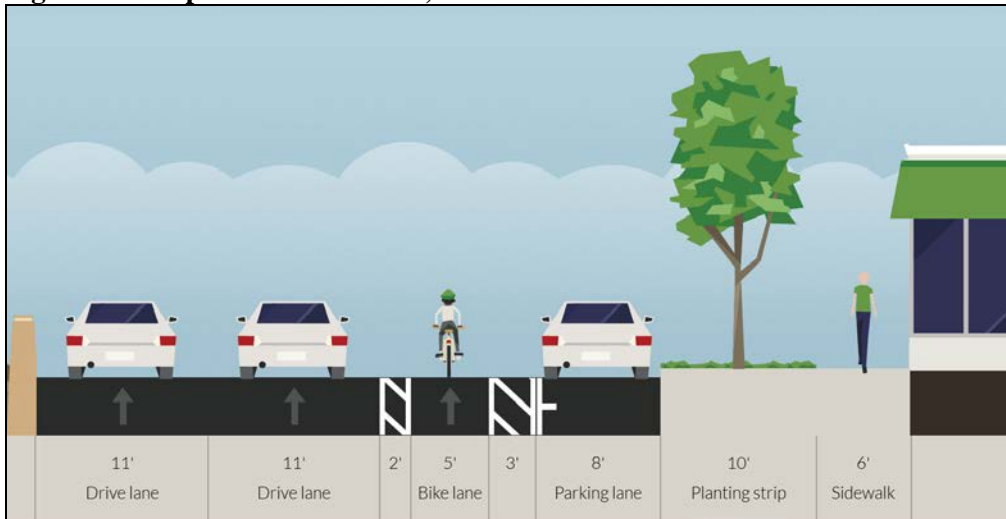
Proposed cross-section; 76th Street to 72nd Street
